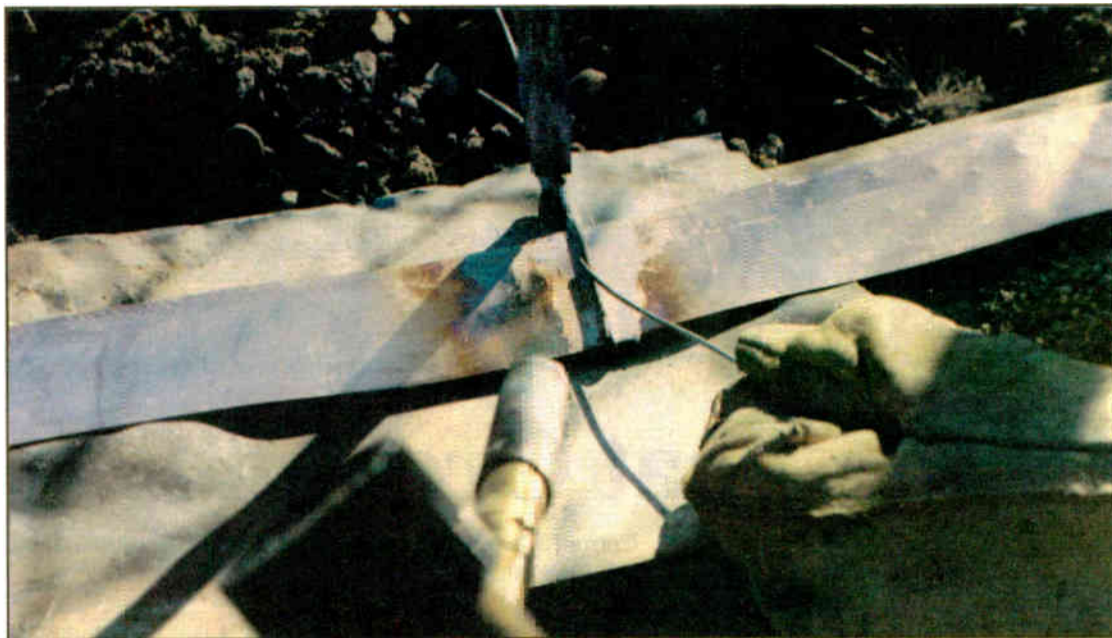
Each radial can be folded over the strap and silver-soldered to the tower perimeter strap.
